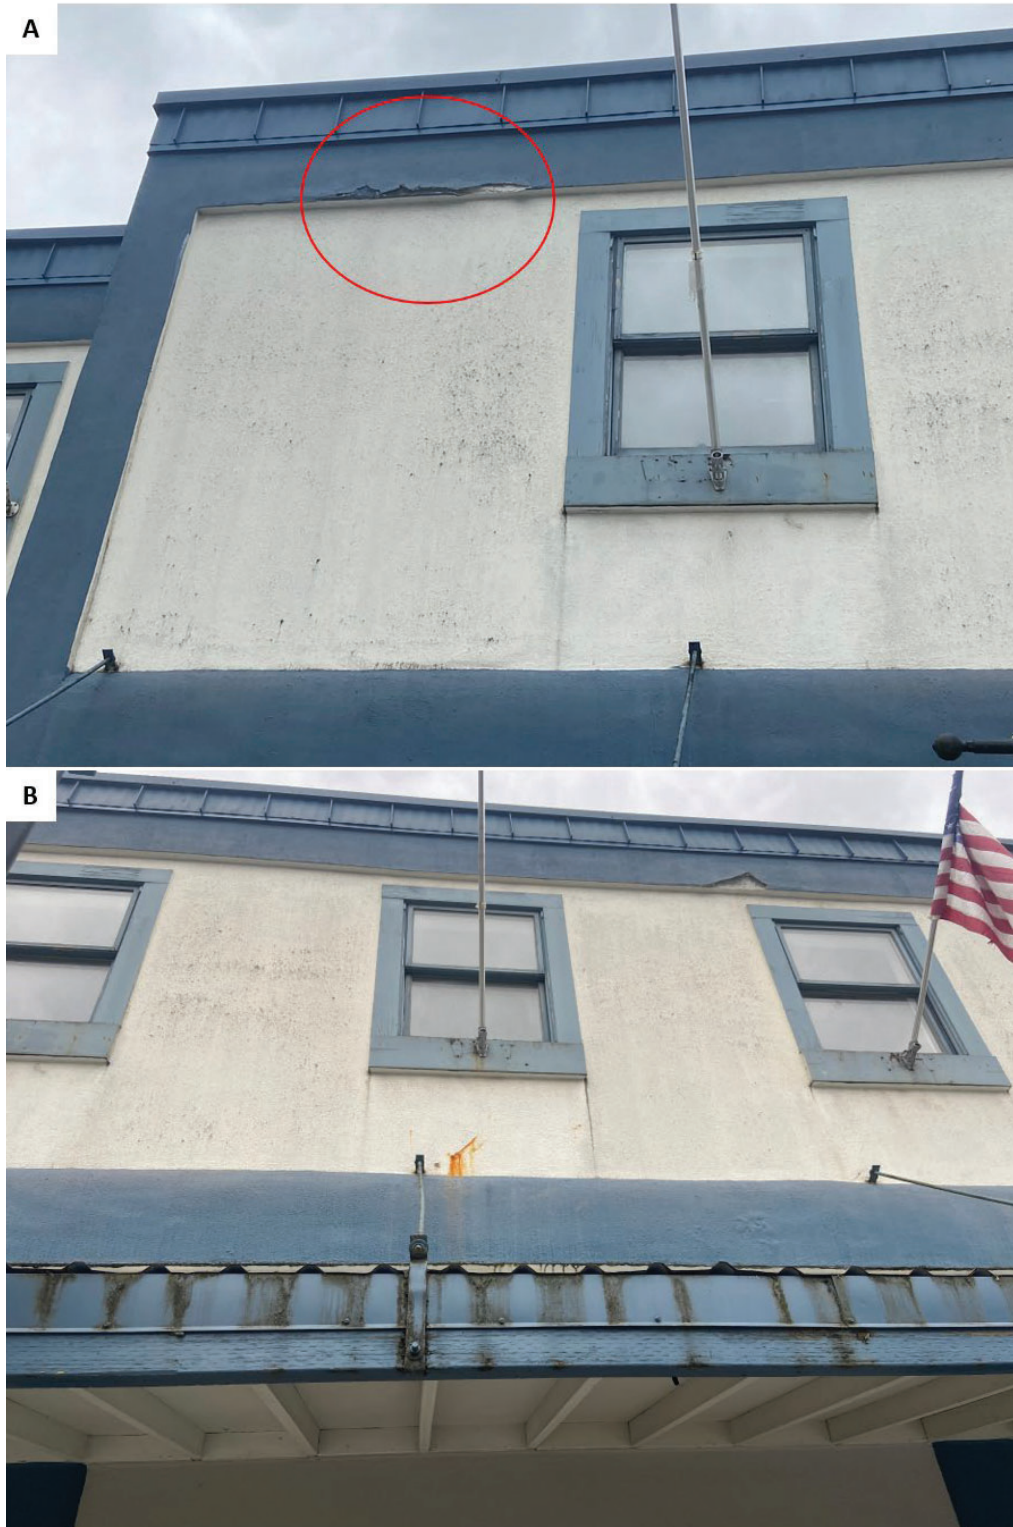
(A) 2nd floor, right side, upper concrete support with failing plaster (red circle), (B) same area but to the left of Fig3A showing the similar separation of plaster from the concrete.
